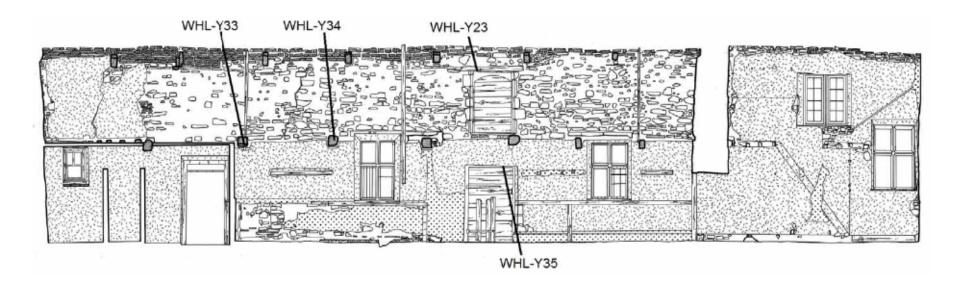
Stables and bothy, south wall (north face), showing the location of samples WHL-Y23 and WHL-Y33-5 (LUAC 1997)
